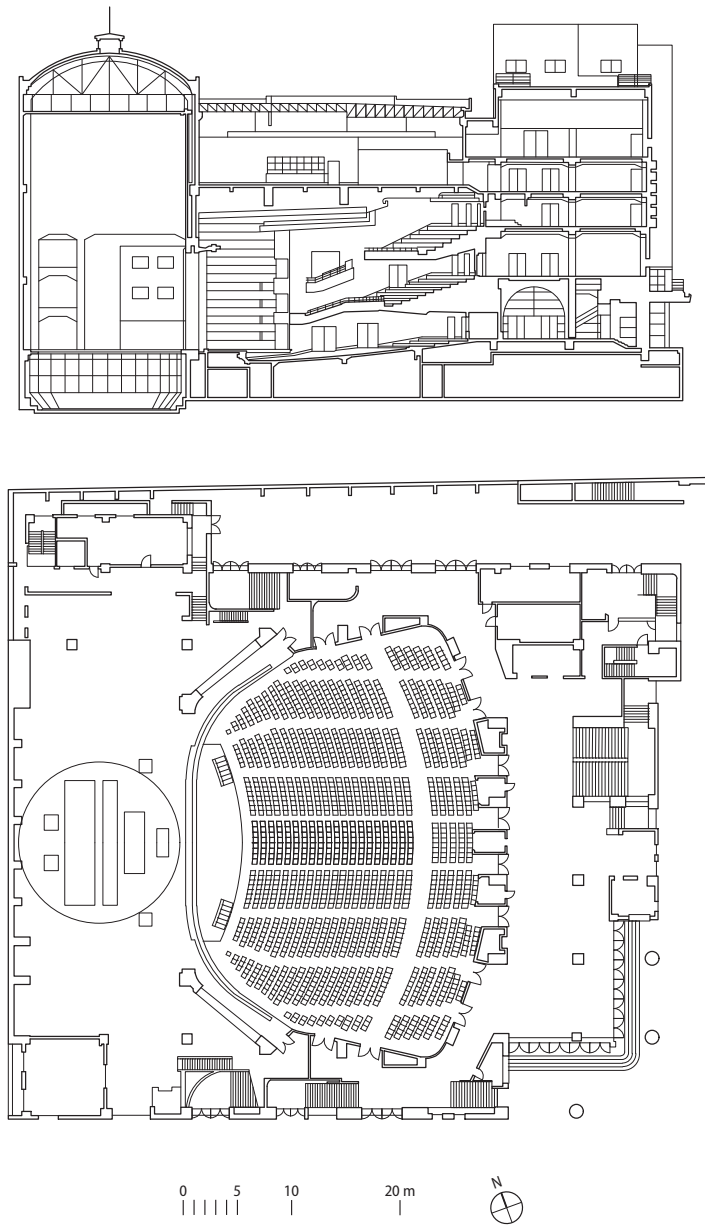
Longitudinal section (top) and floor plan (bottom) of the Takazuka theatre, Scale = 1:700.
